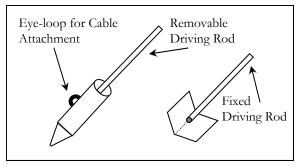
A. Earth Anchor. A metal plate or cylindrical tube that pivots on an attached anchoring rod or cable. The loaded anchor planes sideways against undisturbed soil to provide holding strength.
